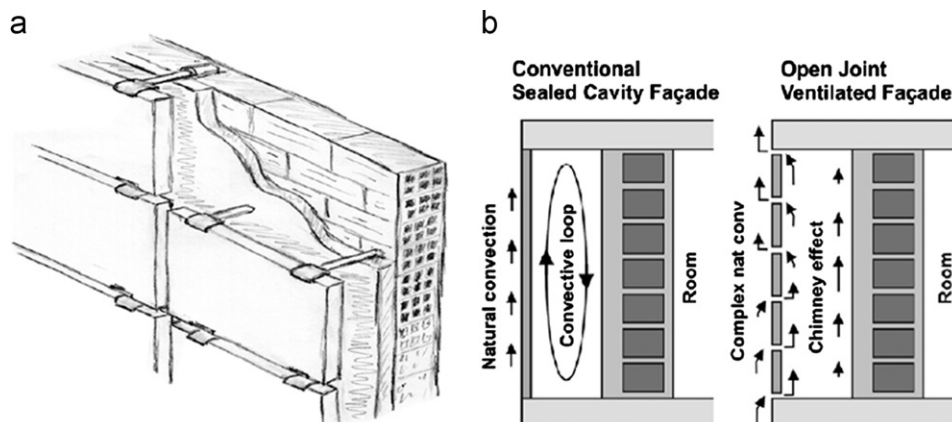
(a) Sketch of an open-joint ventilated façade. (b) Differences in heat transfer processes between a conventional sealed cavity façade and an open joint ventilated façade. [88].
